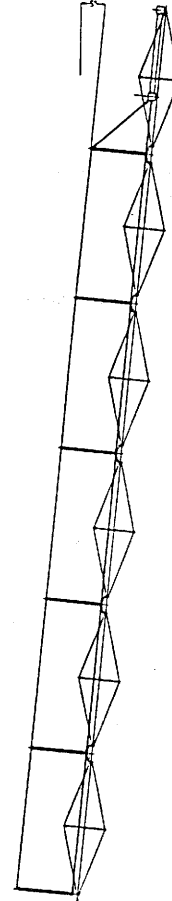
Façade Kirchberg – Vertical section (Height 23m)
